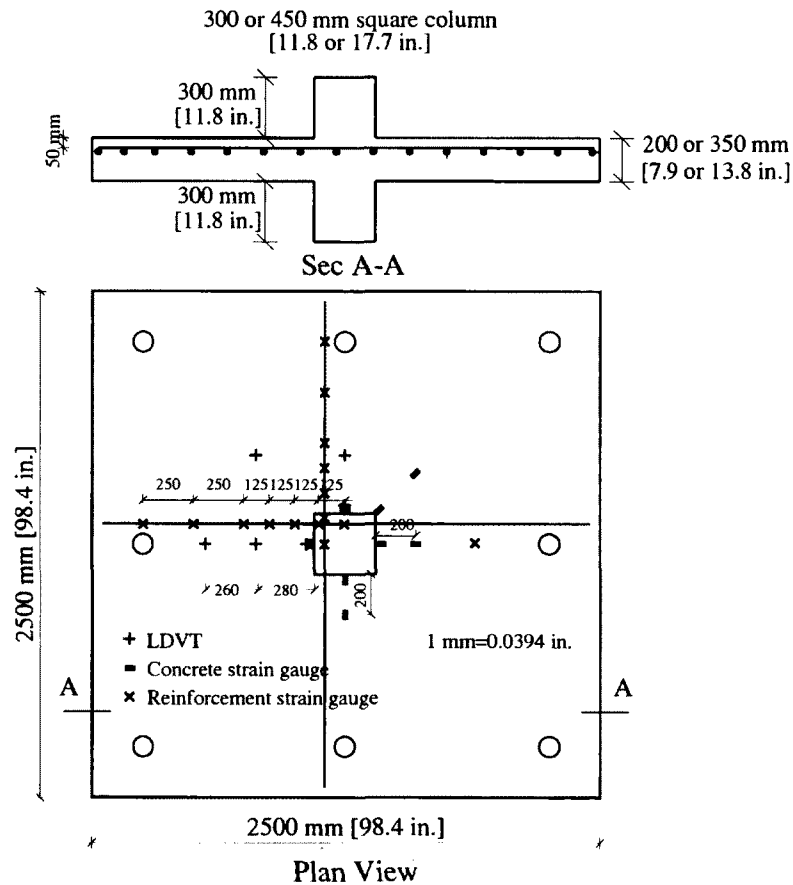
Geometry, reinforcement configuration, and instrumentation
